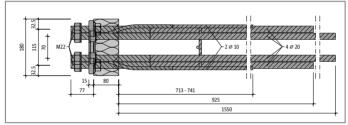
Schöck Isokorb® type KS20-V10: Plan view
